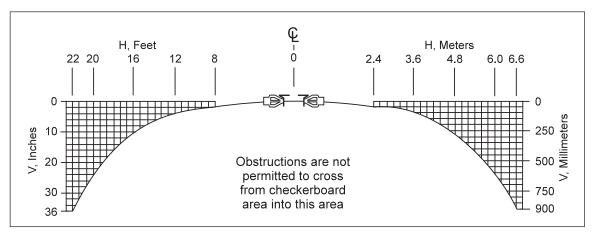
Obstruction area to umbrella pattern away from the mounting wall of extended-coverage sidewall Nonstorage sprinkler
